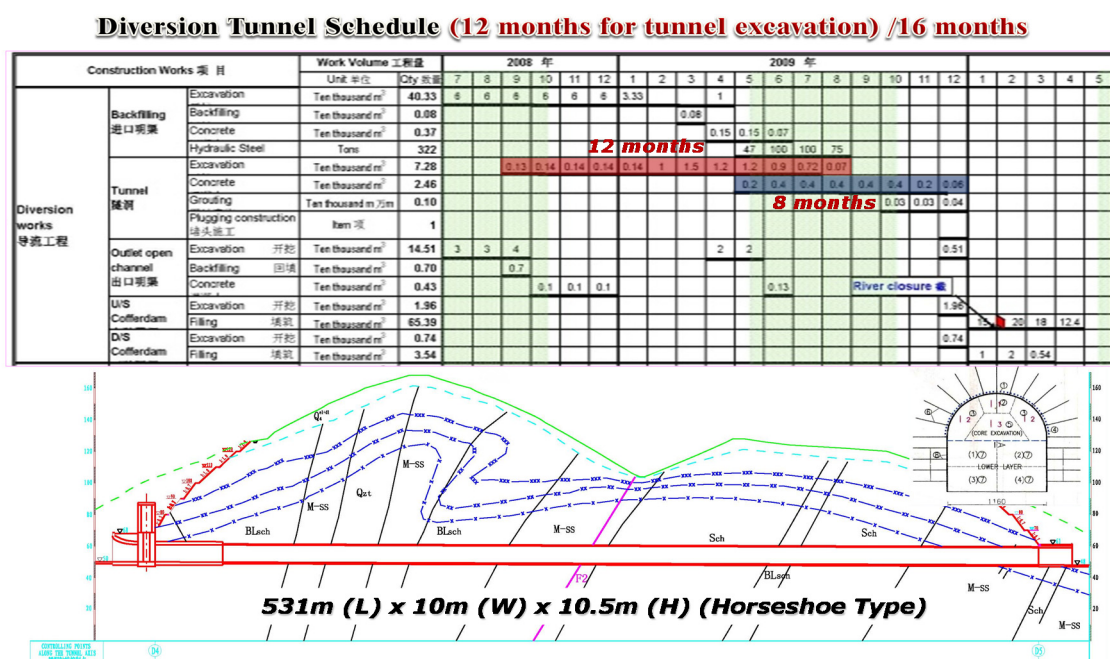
Diversion Tunnel Construction Schedule of Thaukyegat Project
